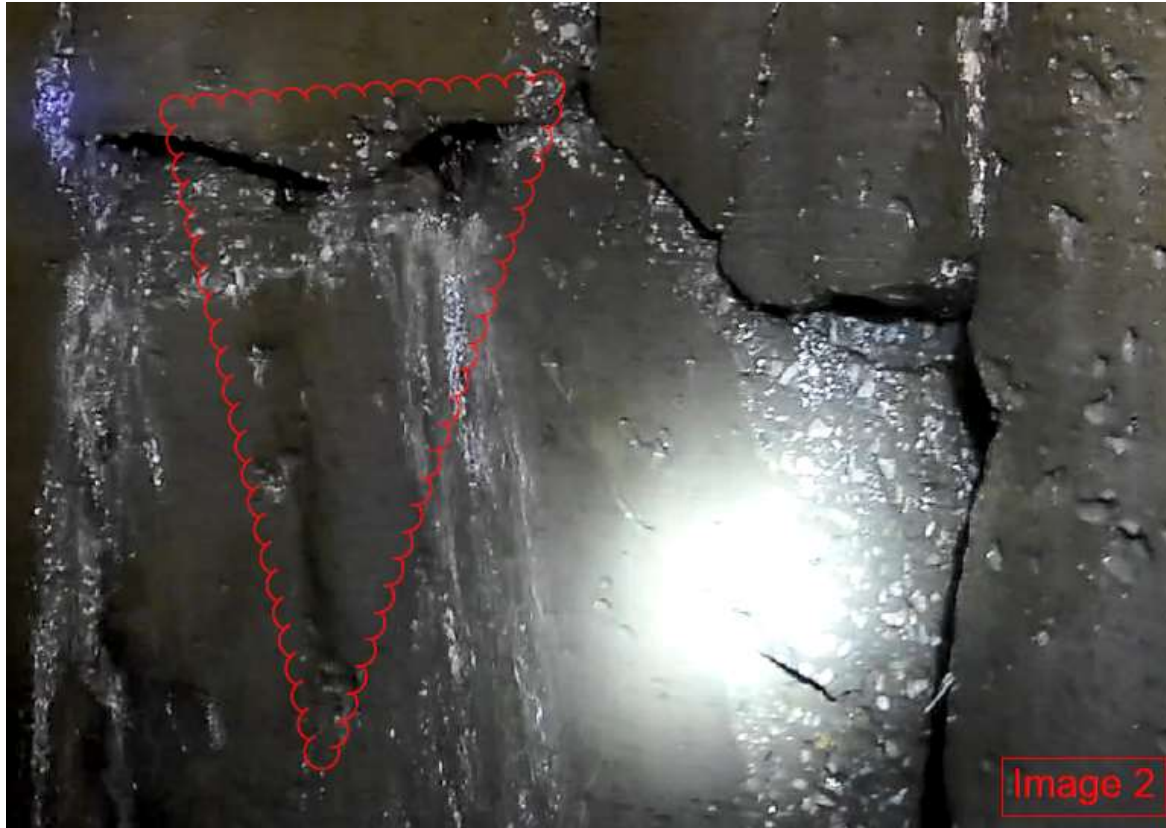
taken at approximate elevation -15ft to -16ft. Multiple reinforcing strands are exposed. Strands appear to have shallow cover. Water intrusion evident.
